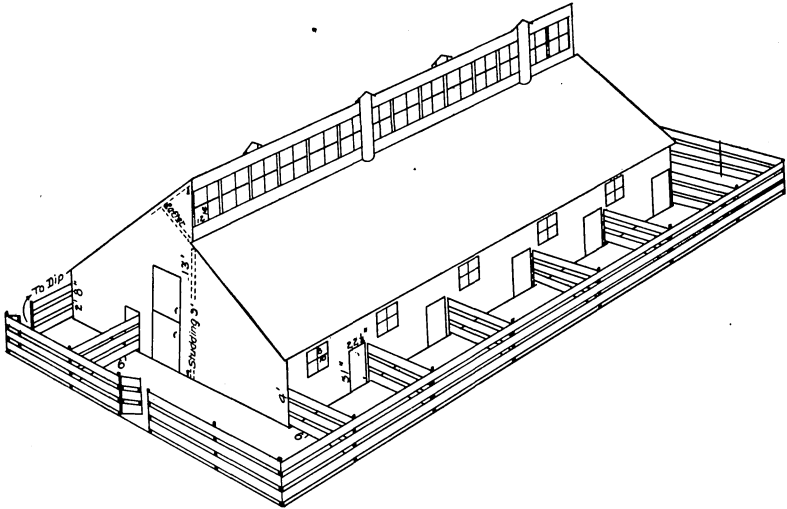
A well-built and well-arranged hog house, showing arrangement of outside pens.
